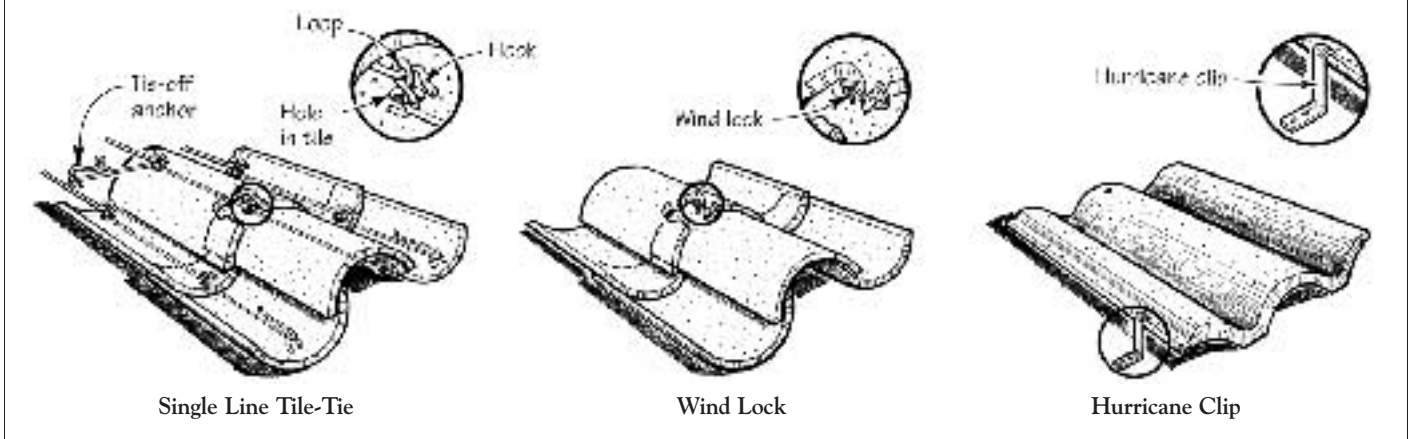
High winds turned clay and concrete roofing tiles into dangerous projectiles that caused extensive damage to surrounding buildings. To prevent this from happening in future storms, South Florida builders are turning to wire tie systems (left) or various types of metal clips (center and right).
